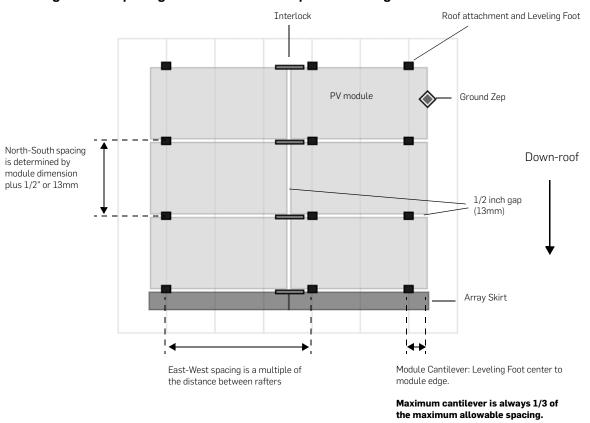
Spacing and Cantilever: Composition Shingle Roof With Vertical Rafters
